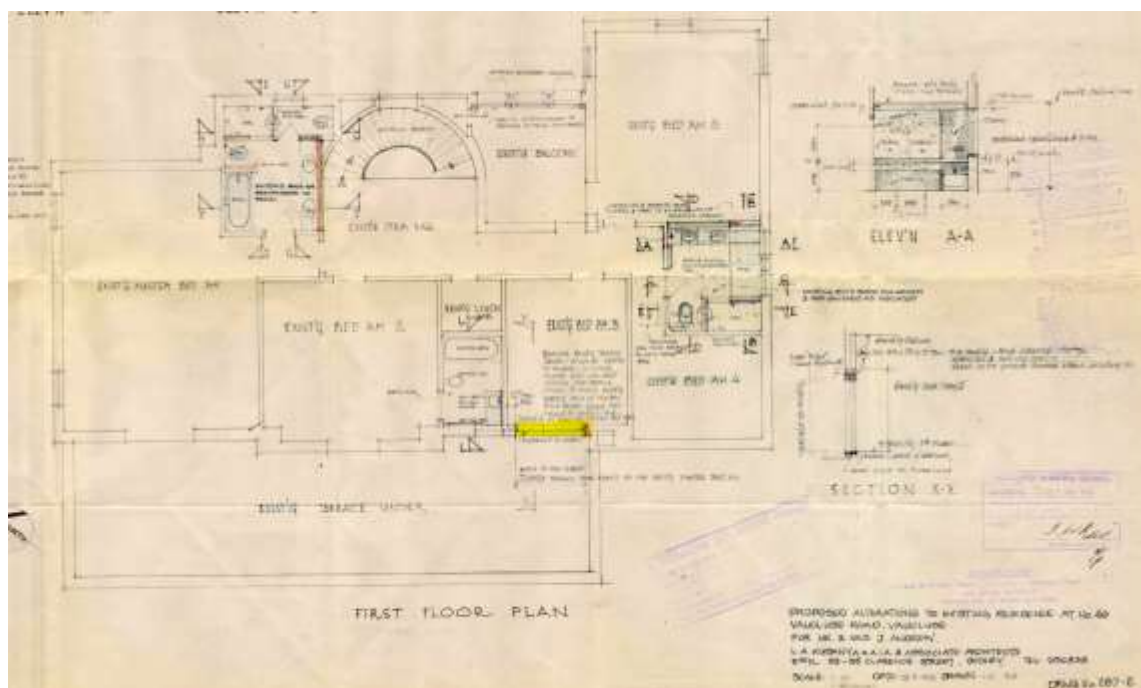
Kubany scheme first floor plan, with works not carried out shown highlighted.
